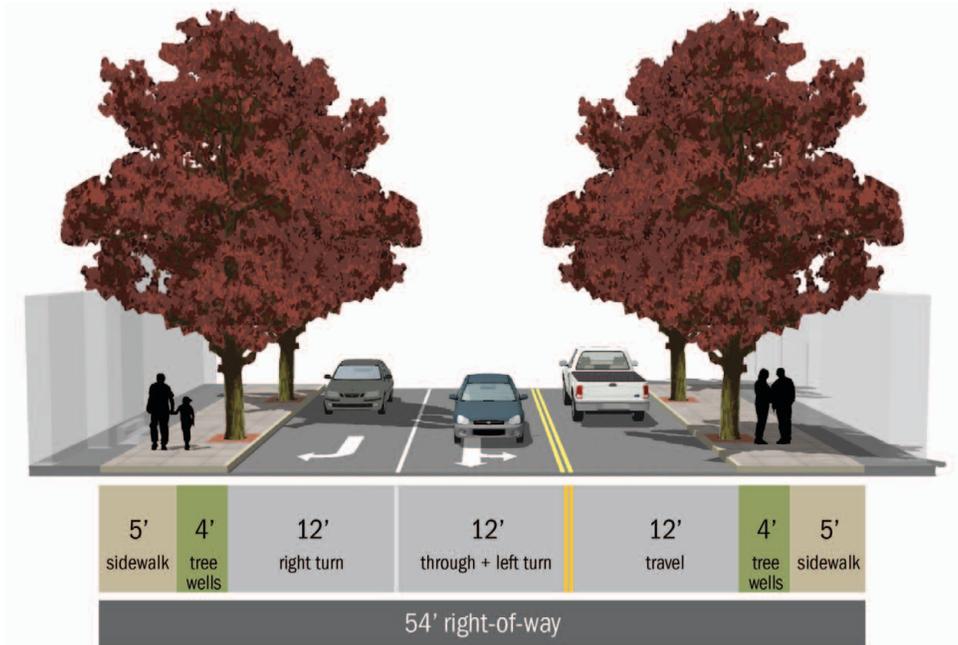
Conceptual Cross-Section for Ochoco Street – West of Main Street within existing right-of-way
